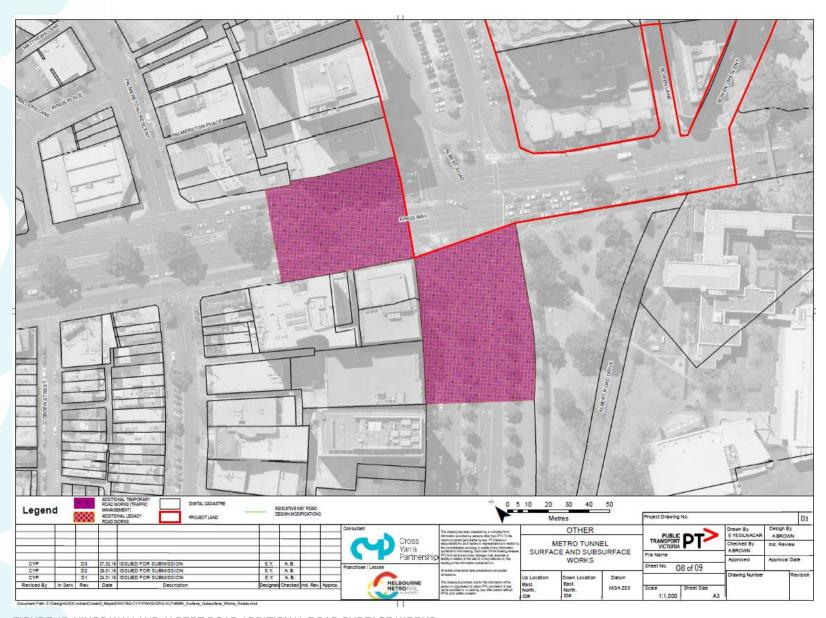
KINGS WAY AND ALBERT ROAD ADDITIONAL ROAD SURFACE WORKS
